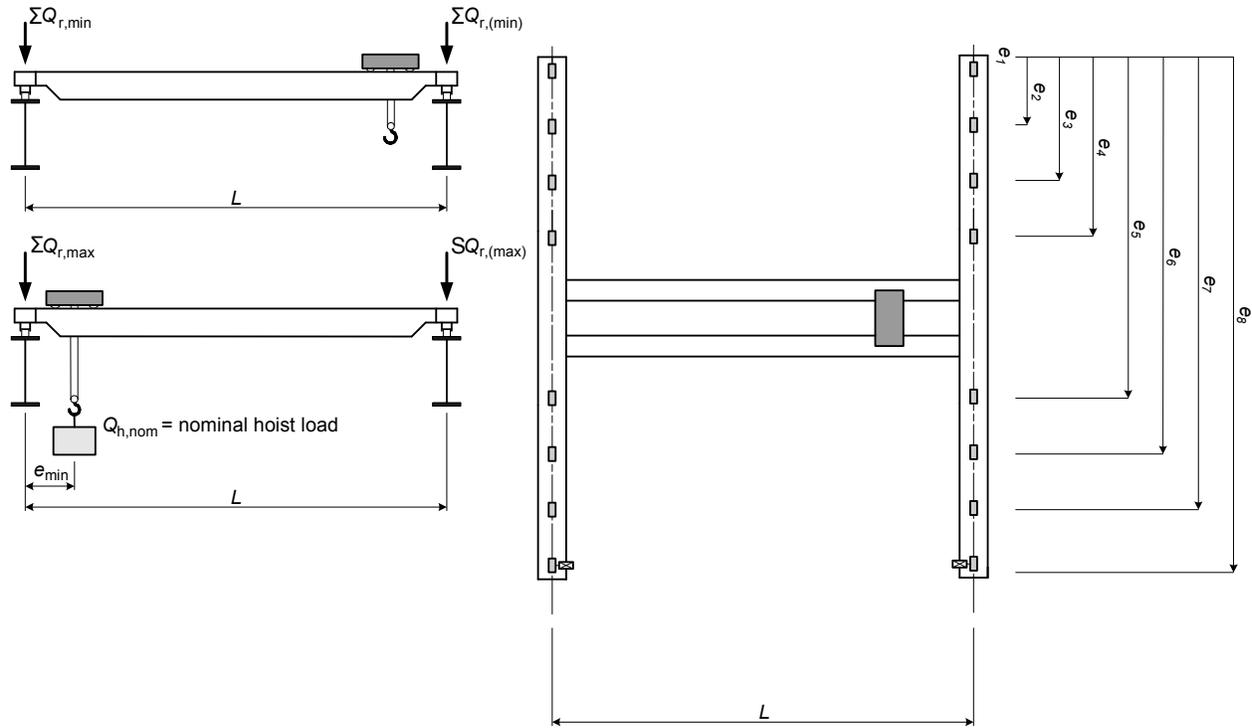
Proposed wheel configuration of a 16 wheel crane
